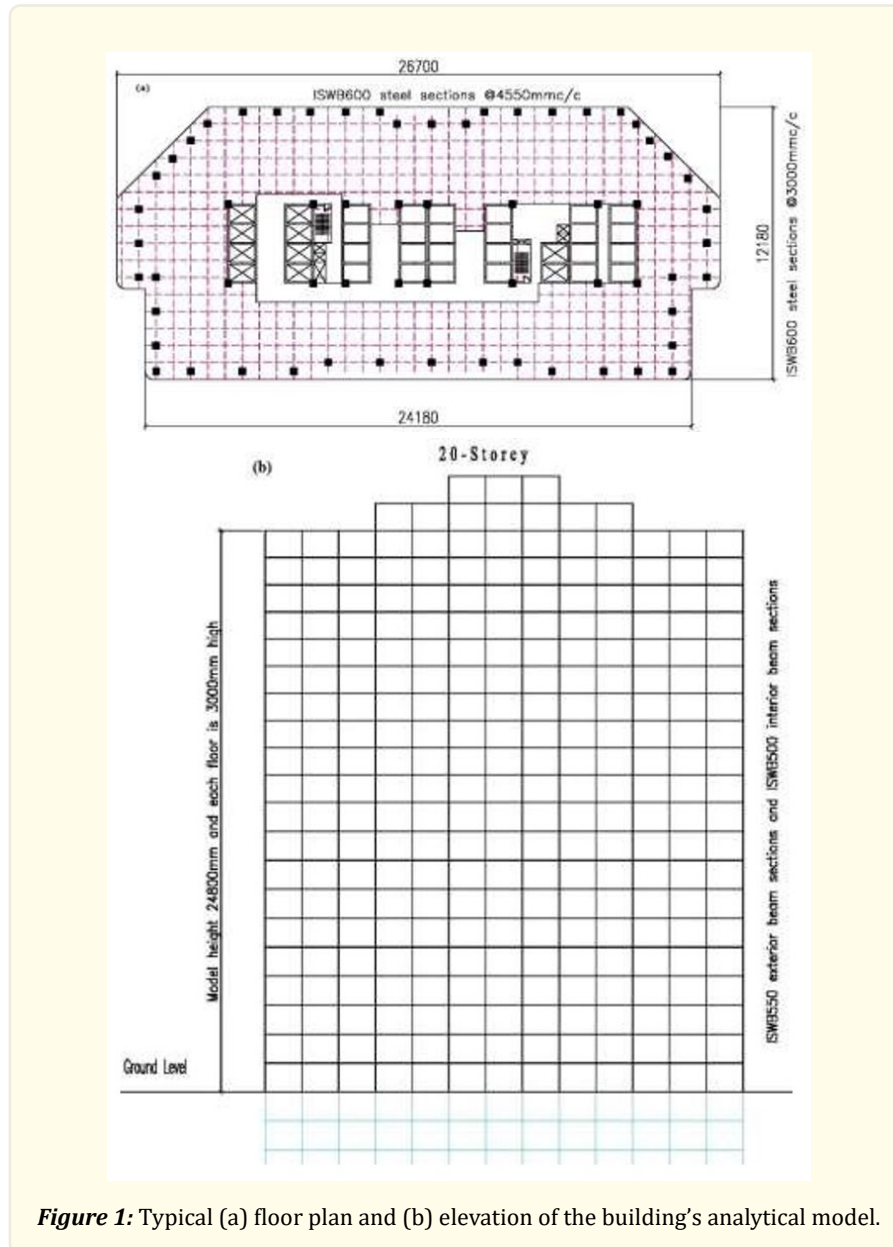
Typical (a) floor plan and (b) elevation of the building's analytical model.
